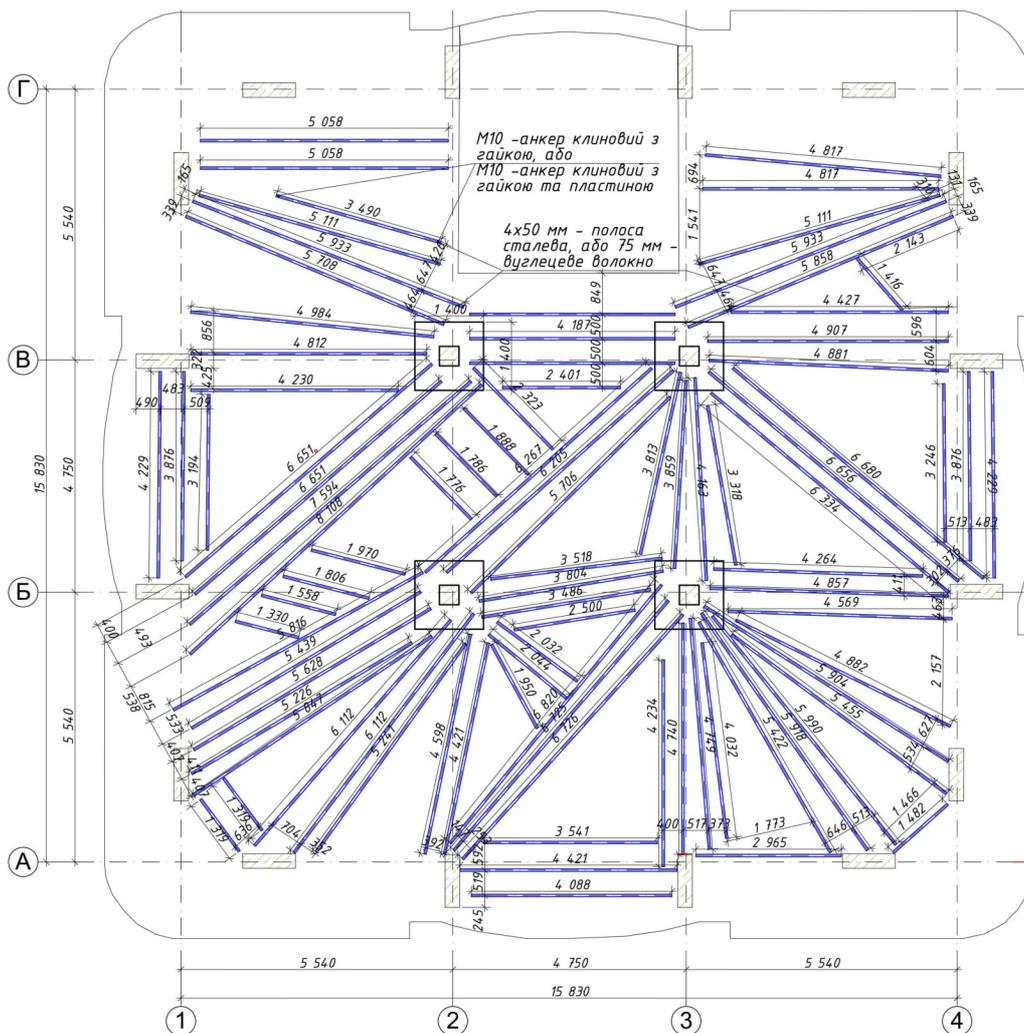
The layout of the floor slab reinforcement elements with the method of external amplification (MAPEI technology, metal plates, or carbon fiber under developed technology)
